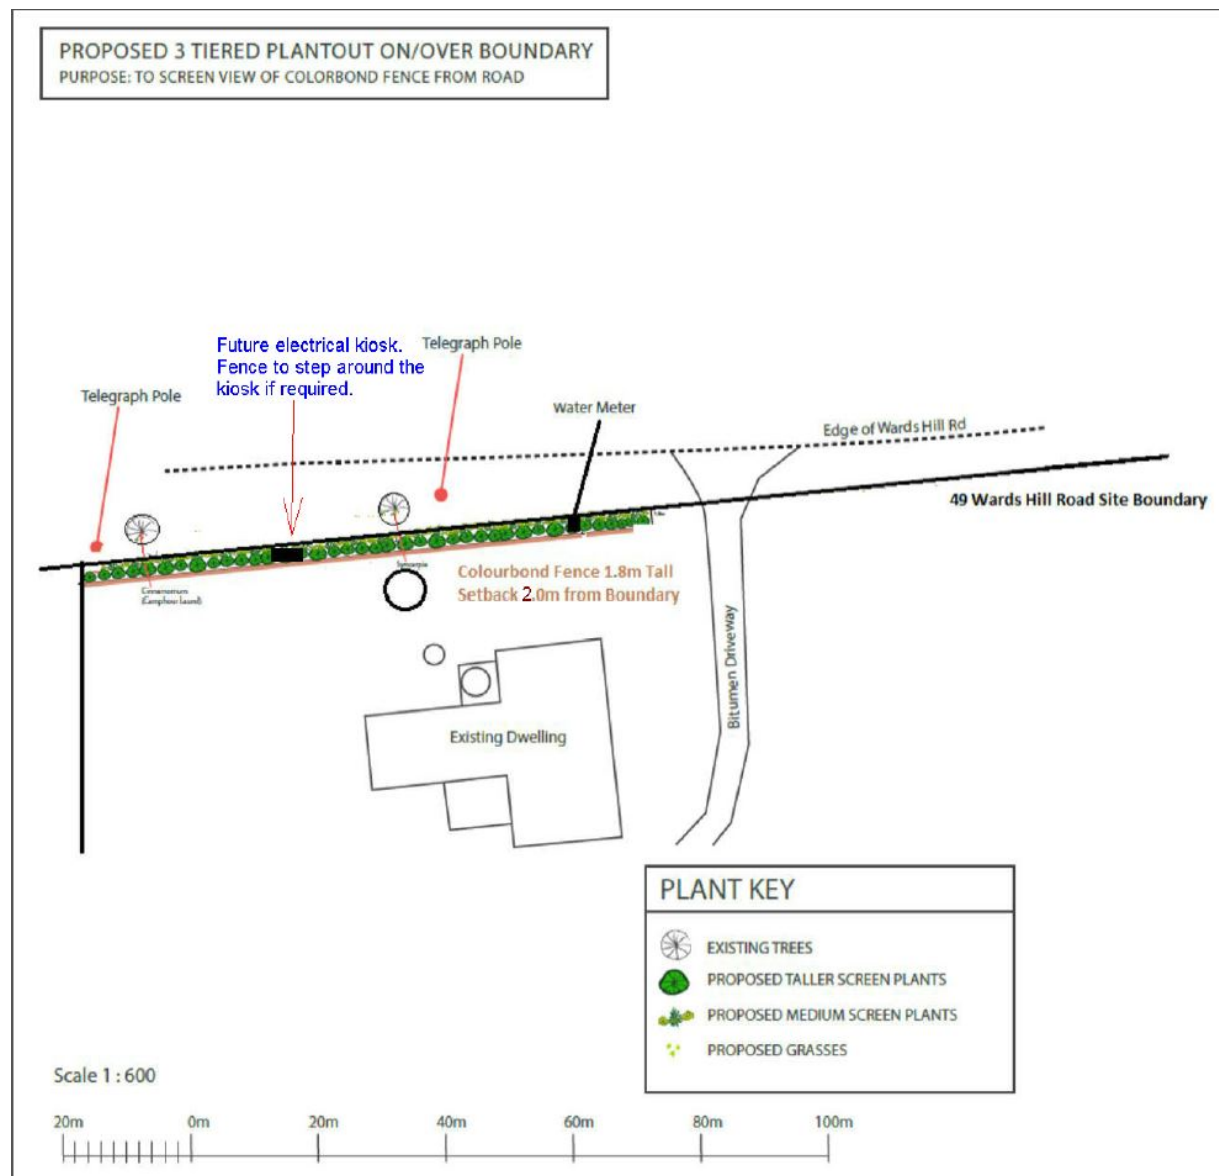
Landscaping Plan with location of electrical kiosk substation indicated. Kiosk size 1.45m wide X 2.7m long X 1.7m high.
